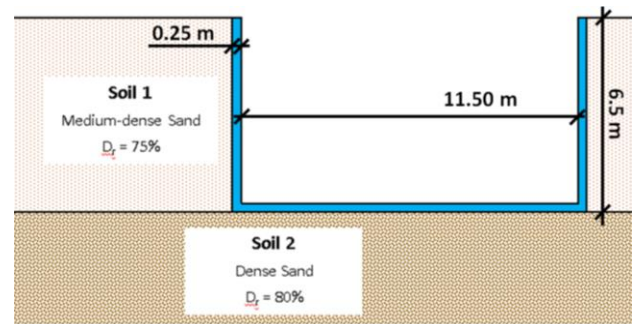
Sketch of U – shaped cantilever wall verified in this study, showing the foundation and backfill soil characteristics, and the dimensions in prototype scale.
